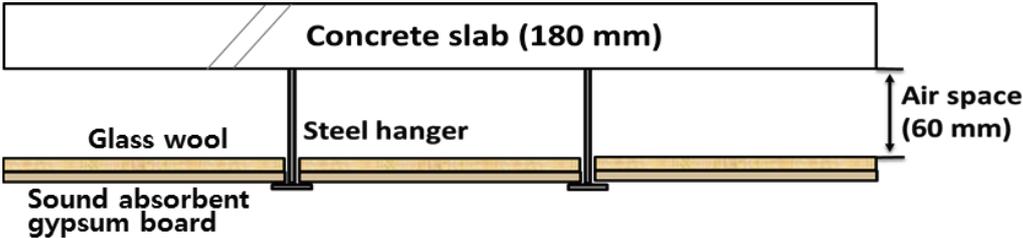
Structure of sound absorbent ceiling (absorbent gypsum board and glass wool)
